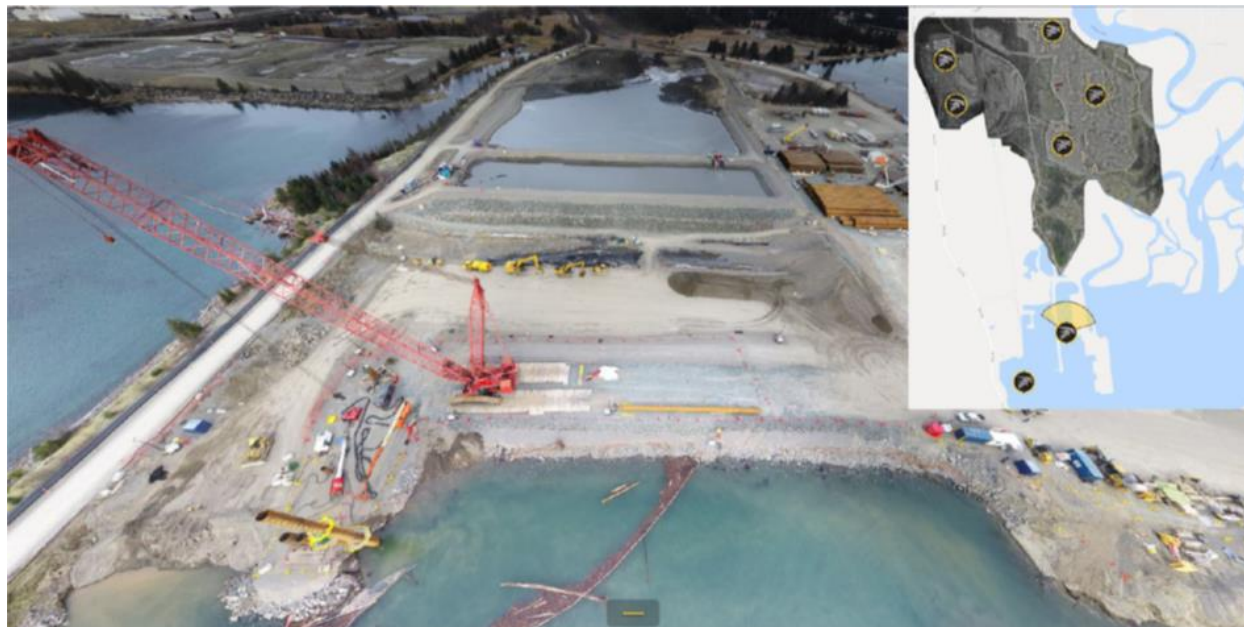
Construction of Materials Offloading Facility (MOF) facing North (December 2019)
